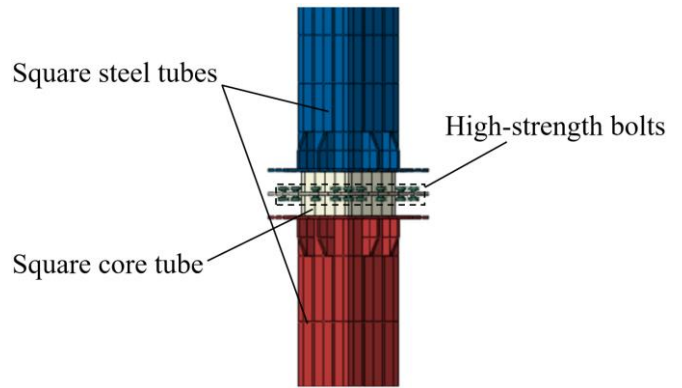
Schematic of the square core tube square steel tube column fully bolted connection joint
